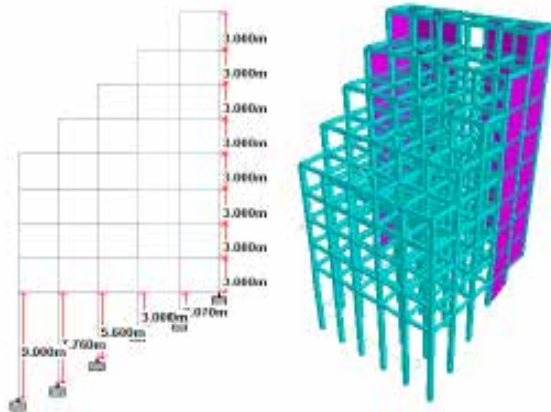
Elevation of L Shape Shear Wall with 30° Slope
